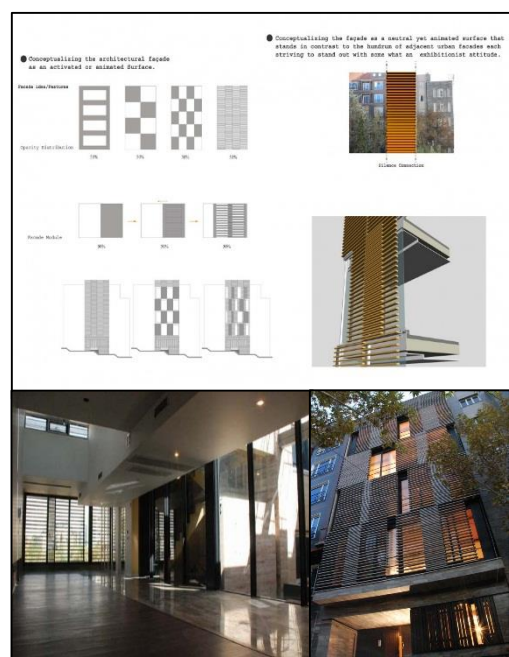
Double skin façade framed outdoor vistas in Khorana Office Building by Rambod Eilkhani, (Eilkhani, 2012)
